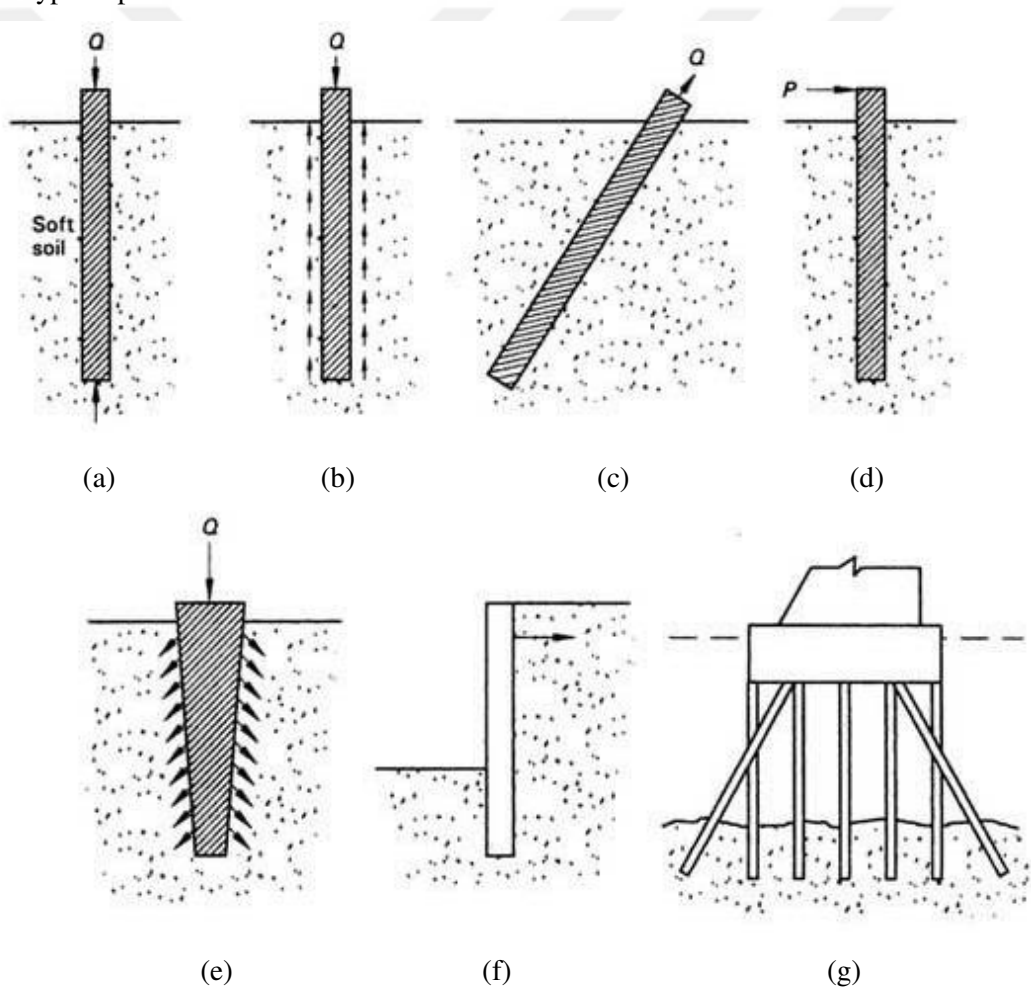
Types of piles due to function or action, (a) point bearing pile, (b) friction pile, (c) tension or anchor pile, (d) laterally loaded pile, (e) compaction pile, (f) sheet pile wall, and (g) piles to safeguard foundation against scour
